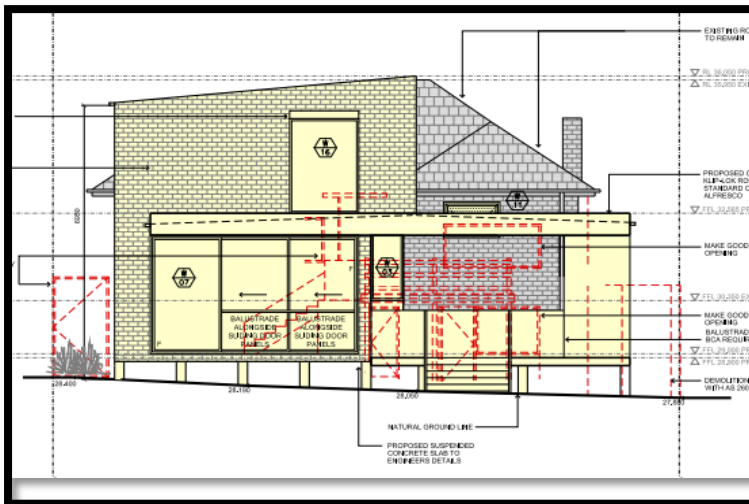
view of the extension. Note the new addition is on piers due to flooding issues.
